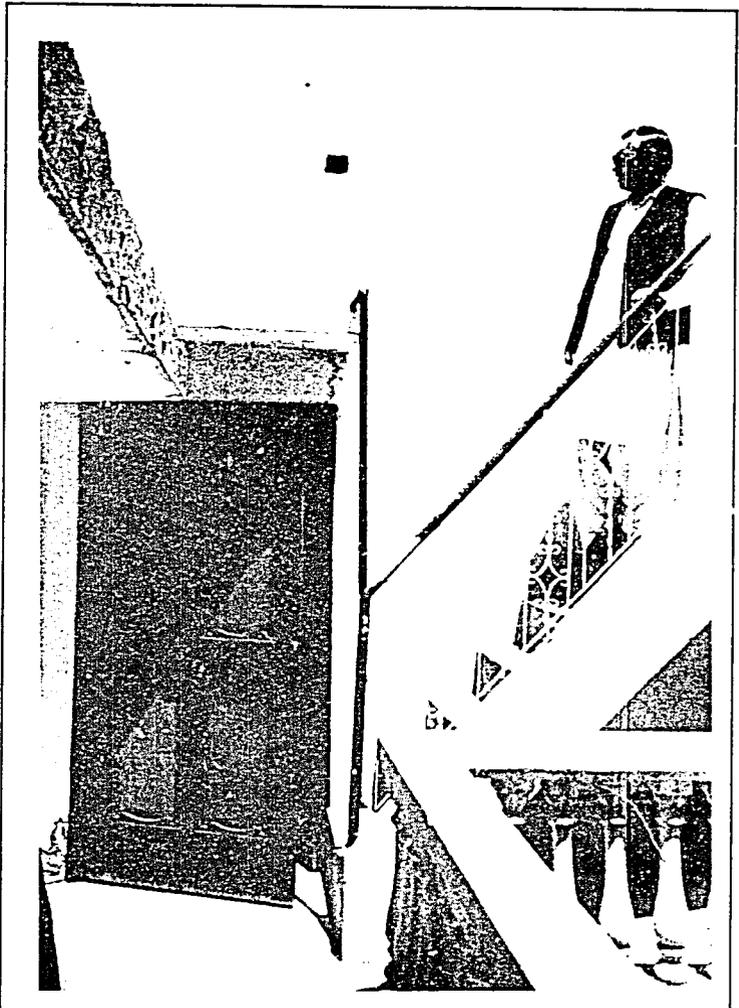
Quetta AID/REP Office Facility. Doorway to roof. Coaxial cable to be run through frame or wall to roof.
